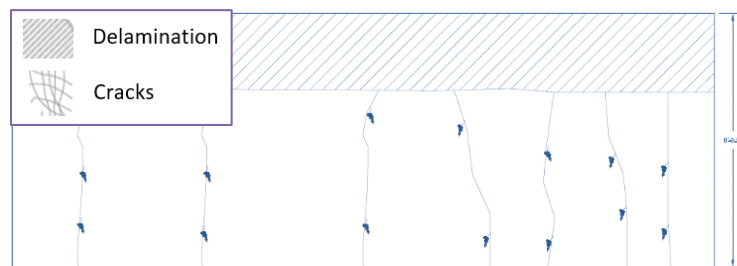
SP7 Note the horizontal and vertical cracking extending beyond the top layer of reinforcing steel.
